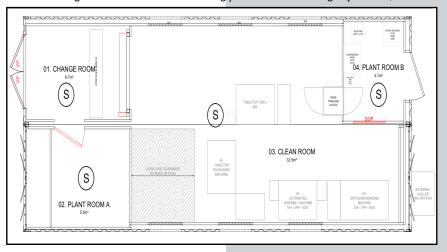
Sound Level Monitoring positions at bench height (plan view)
